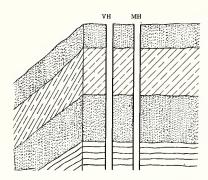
Disposition of drill holes and test pit for experimental work: VH, vibrodrilled hole; MH, hole drilled by hand.
